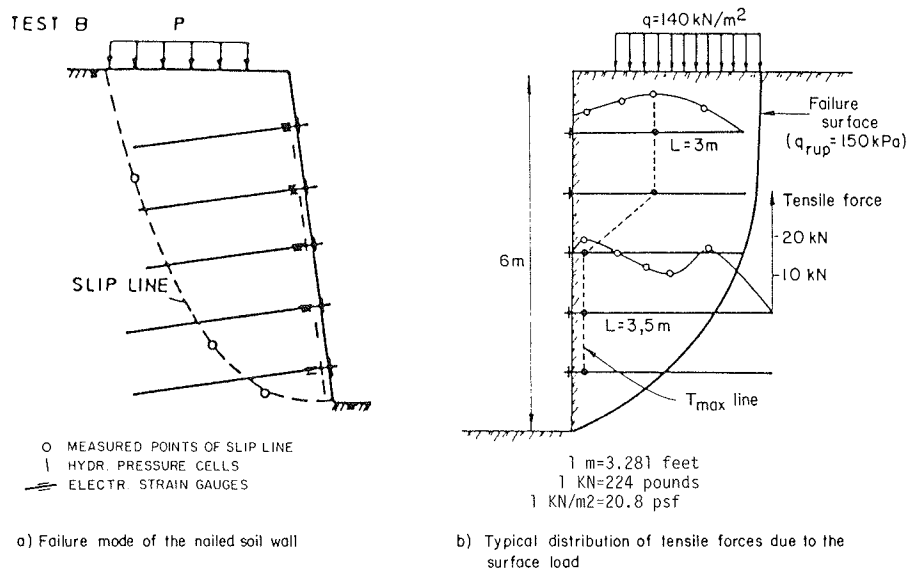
Experimental results of a full-scale loading test on a nailed soil wall. [Stocker et al., 1979]
